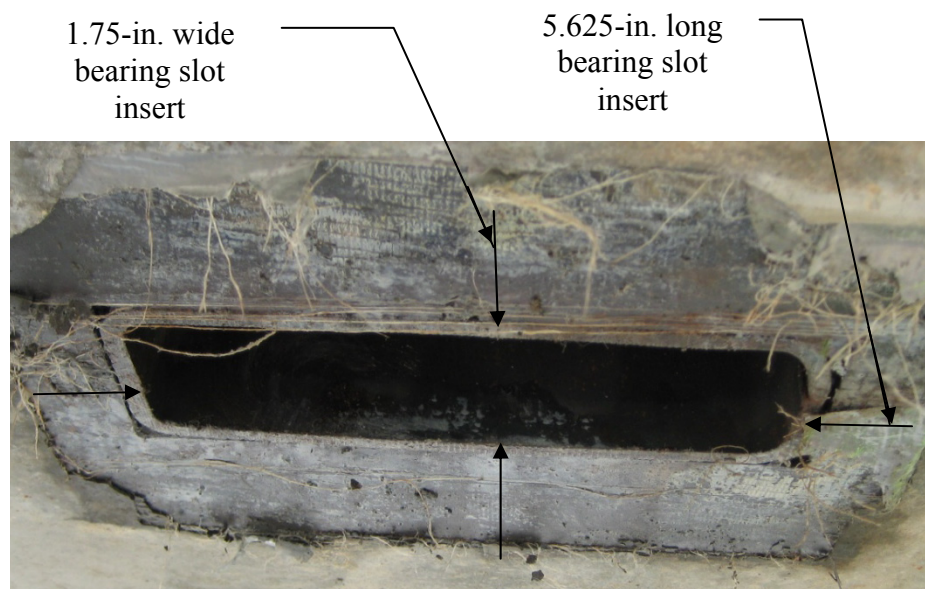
Bearing slot insert for expansion bearing set-up
